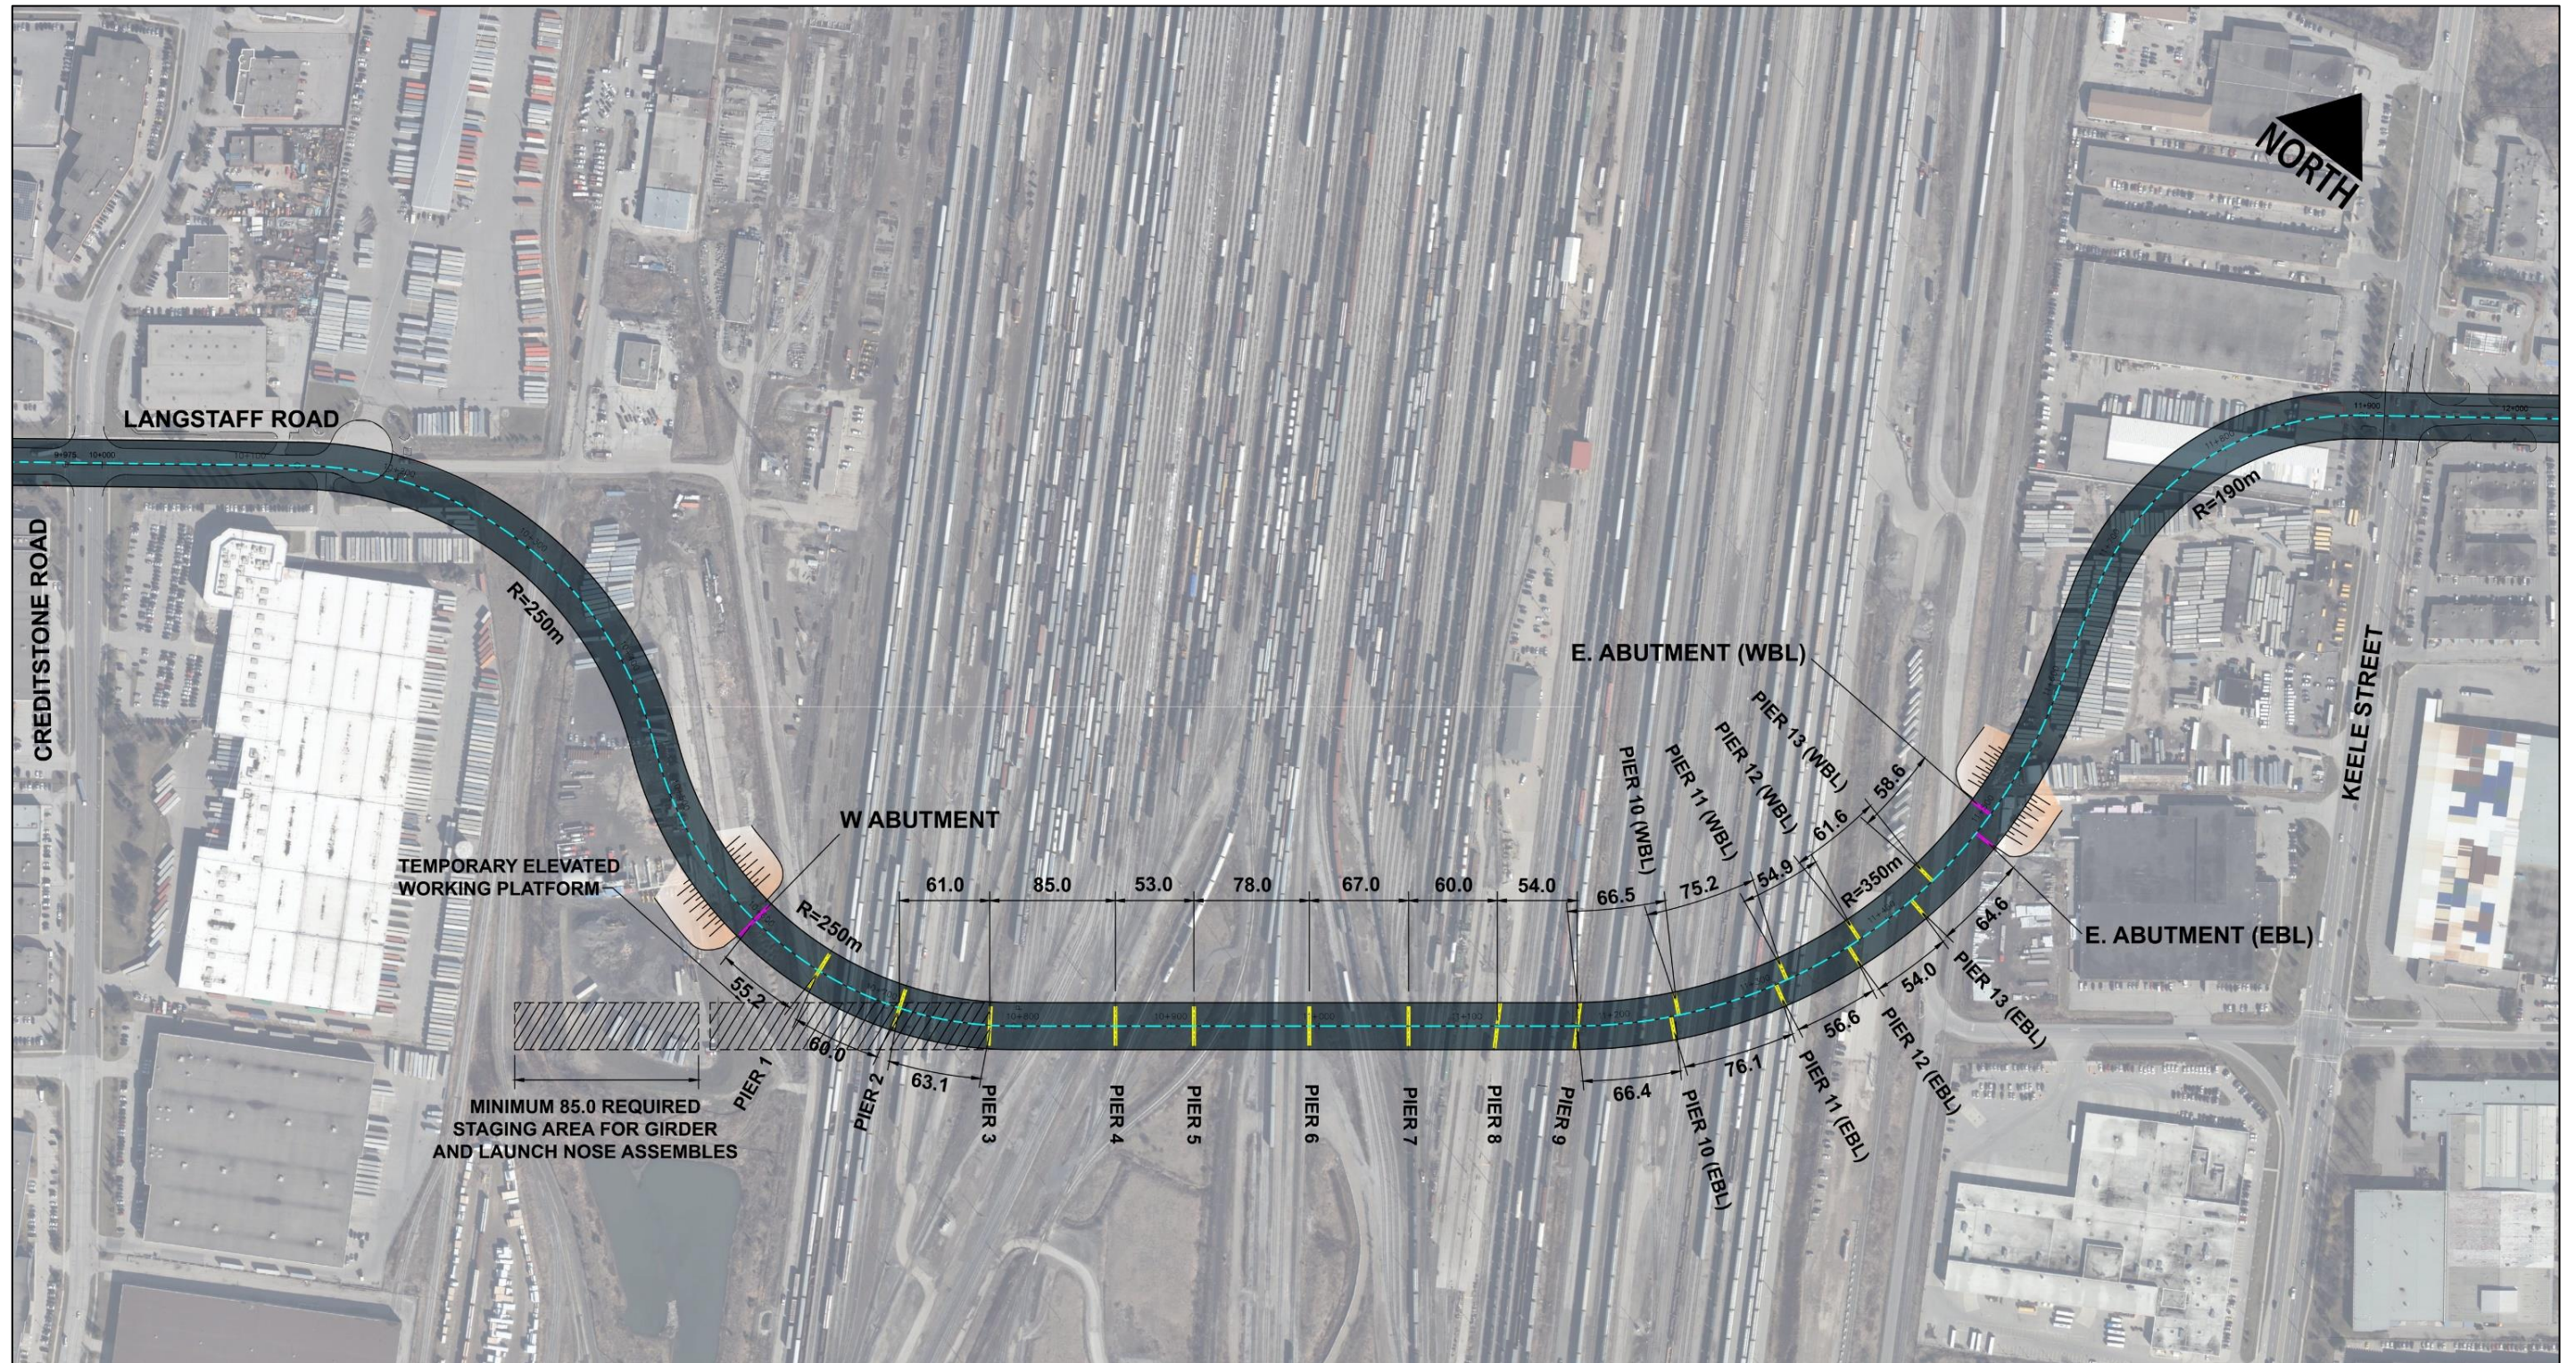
CN Crossing Alternative 2 – Extradosed Bridge
